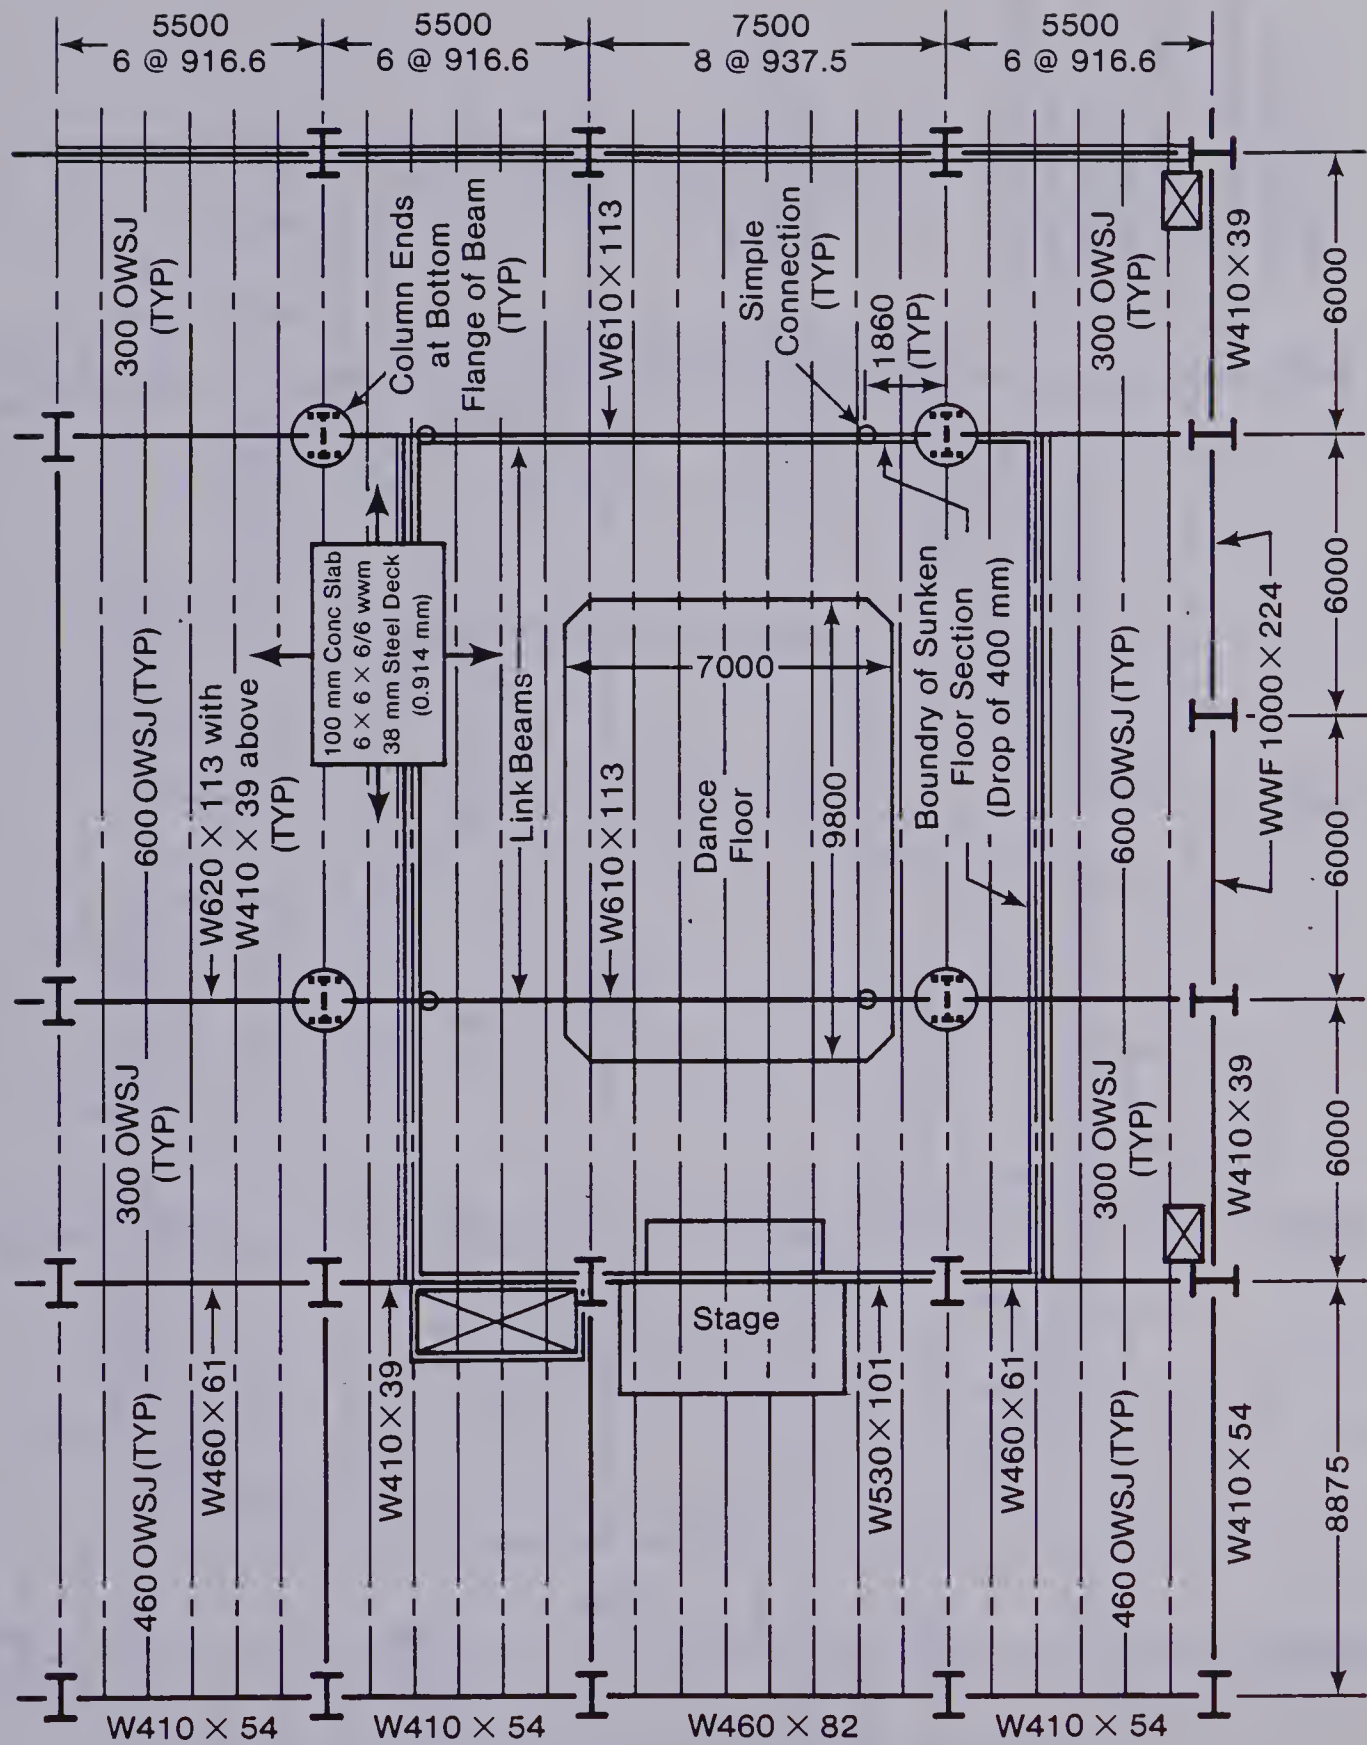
Structural Layout of Dance Floor and Surrounding Area
